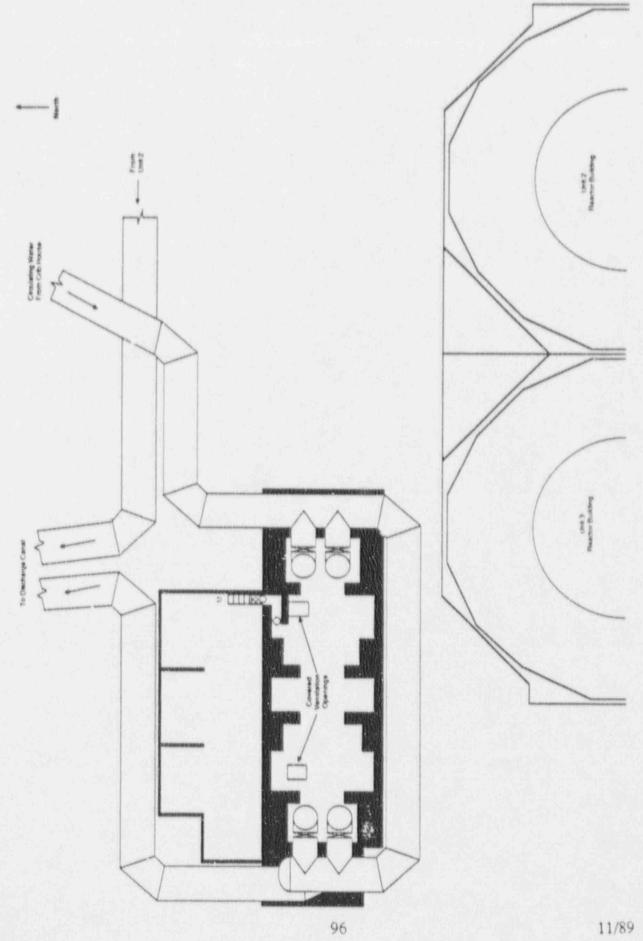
Dresden Unit 3 Turbine Building, Elevation 481'-0"
